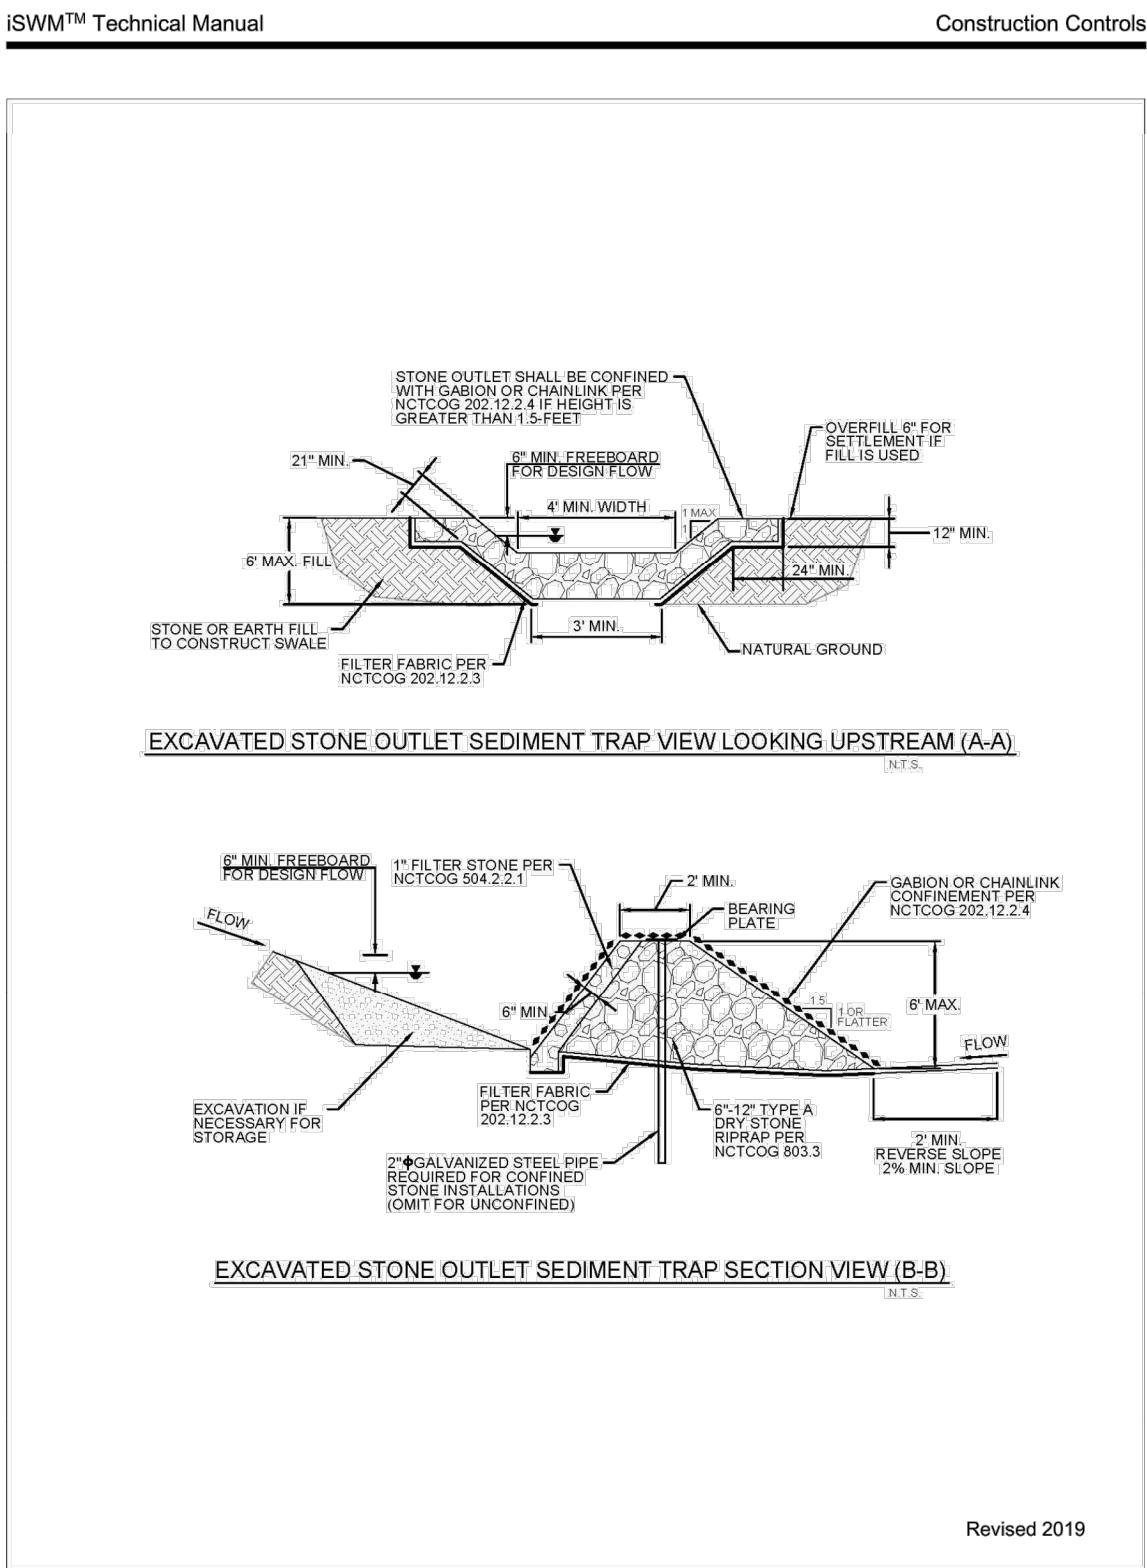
Schematics of Excavated Stone Outlet Sediment Trap
